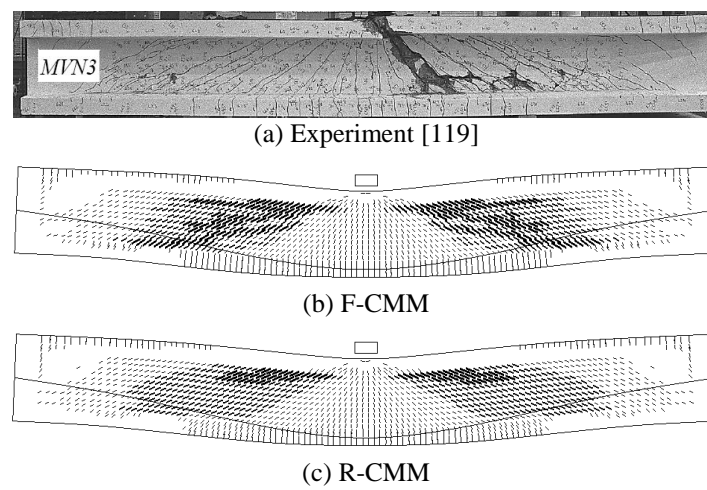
Beam MVN3: cracking patterns at failure.
